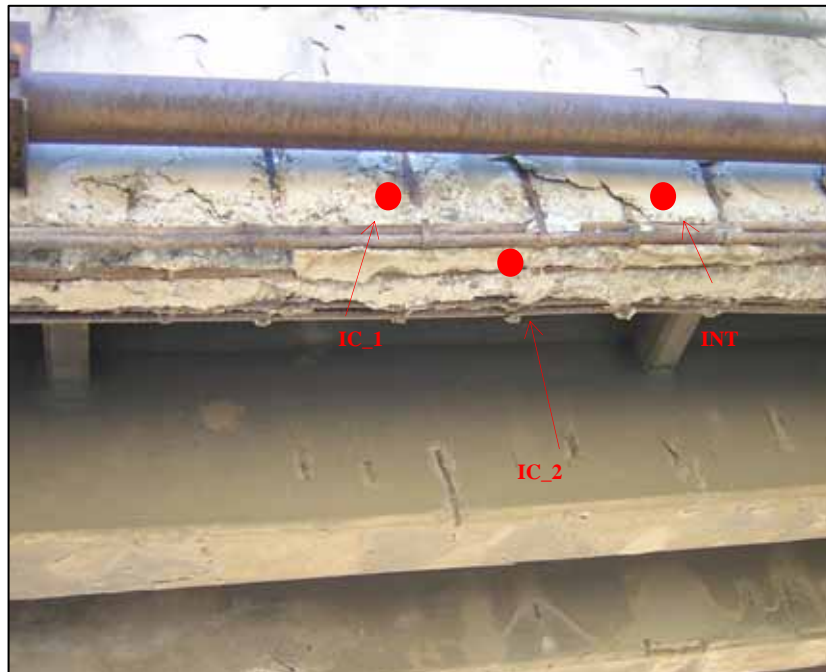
Specimens of concrete, take from the Fiumarella bridge
